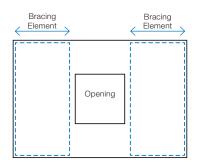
LARGE OPENINGS AND BRACING ELEMENTS
